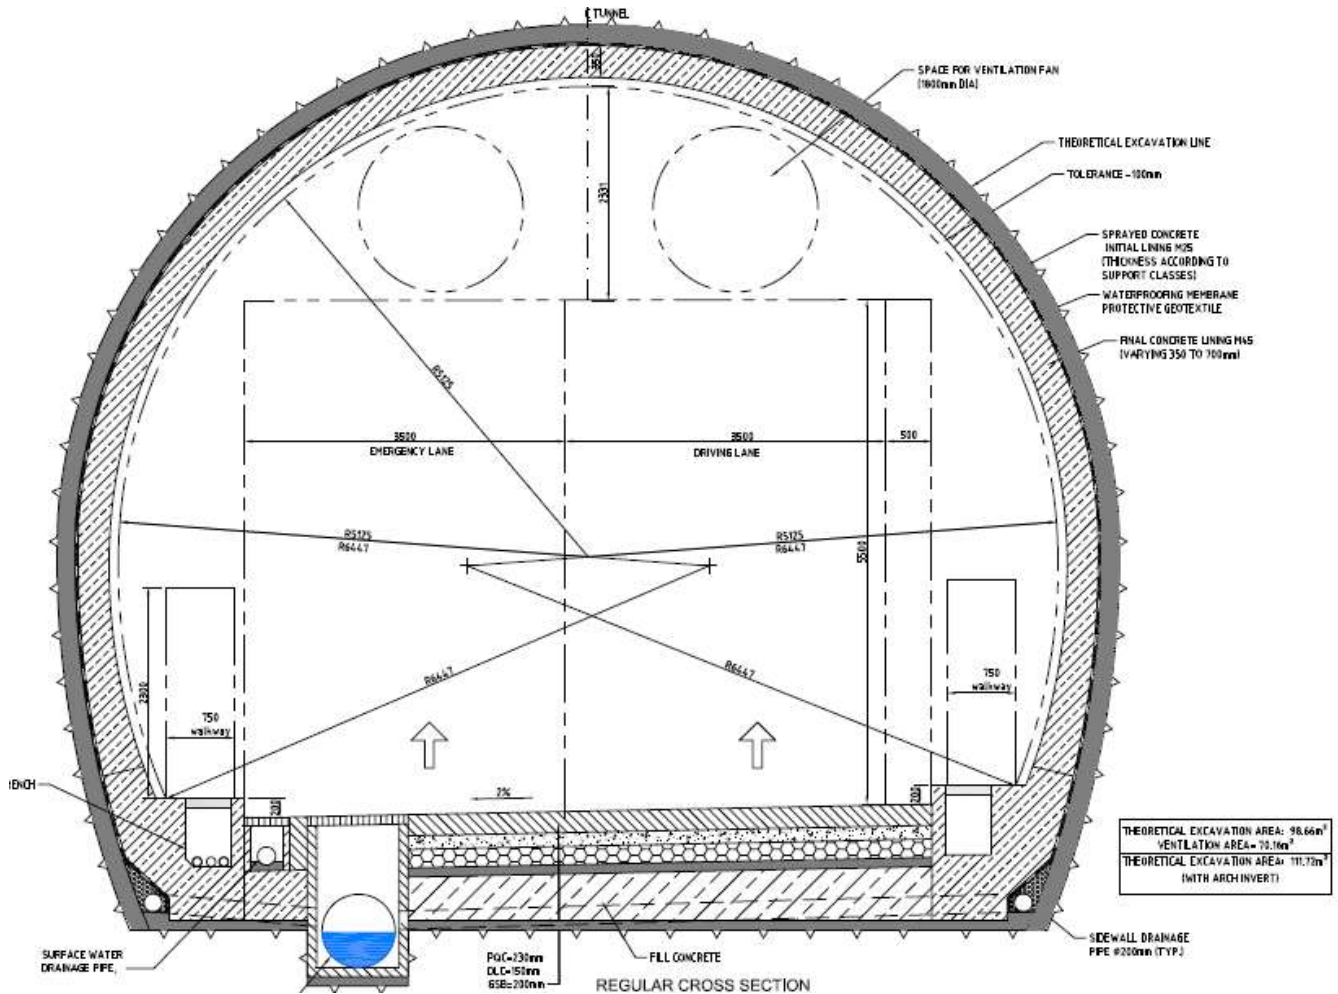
Typical Flat Invert Tunnel Cross Section - Inner Lining geometry
